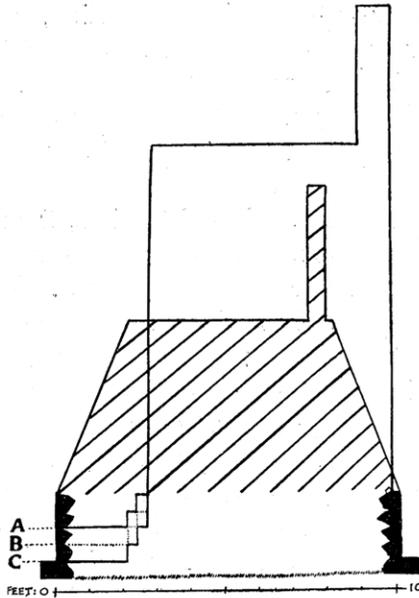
SECTION OF THE WALL, SHOWING A.—THE EARLY FOUNDATION AT THE BRIDGE AND THE EAST TURRET. B.—THE SAME AT THE WEST TURRET. C.—THE SAME AT POLTROSS BURN MILECASTLE.
